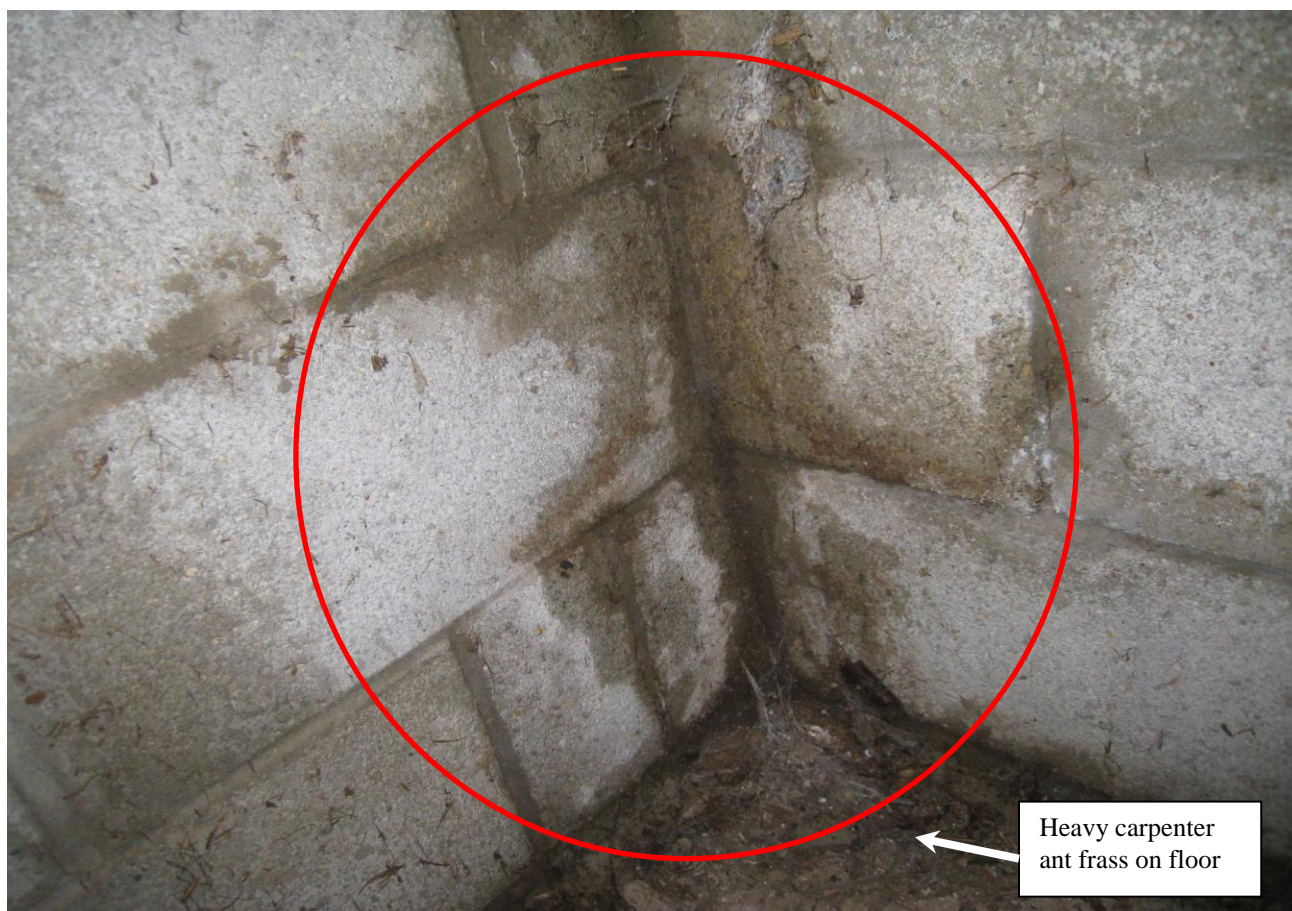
Wet walls in crawl space; correct grading and add covers on recessed access doors. Recommend keeping crawl well ventilated to avoid mold, water or structural damage and attracting wood destroying insects. There was heavy carpenter ant frass on floor, sills and walls in crawl space. Recommend proper treatment; ask Association who is responsible for treatments.
